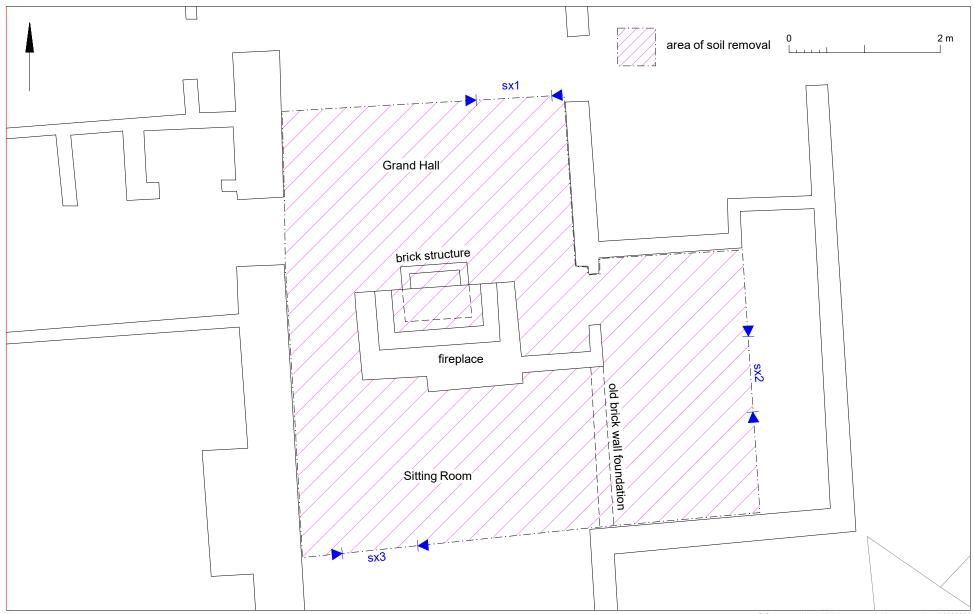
Close-up plan of the soil removal area showing the location of the brick structure and old brick wall foundation
